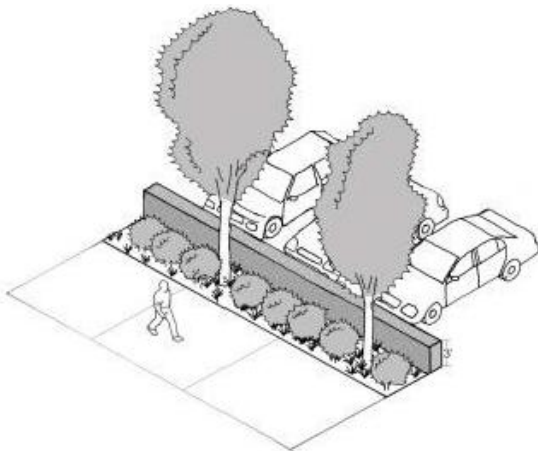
(B)(1)(a). Parking lot planting buffer with low wall.
